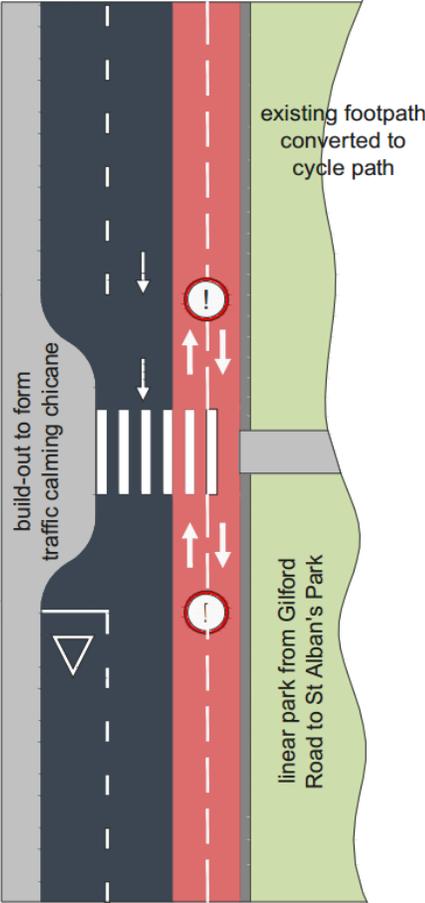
traffic calming chicane located at typical crossing point at existing access points. This will provide better connectivity with land side footpath
